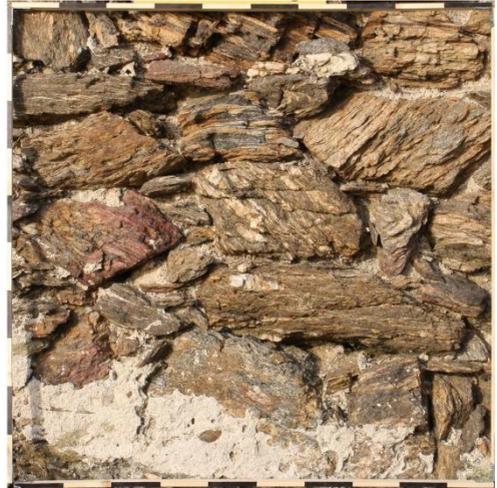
Masonry sample of Trabuccato tower (Murru, 2014).
